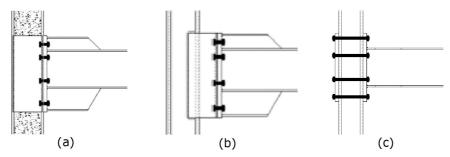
Bolted beam-to-column joint configurations (Univ. Liege)
